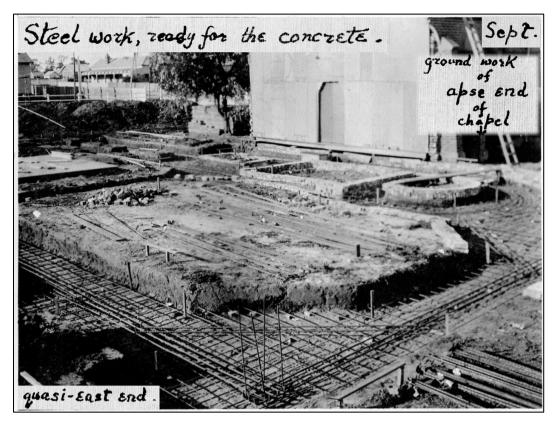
St Ambrose archival photographs showing the shallow, reinforced concrete footings constructed in the 1920s (Source: St Ambrose archives)
